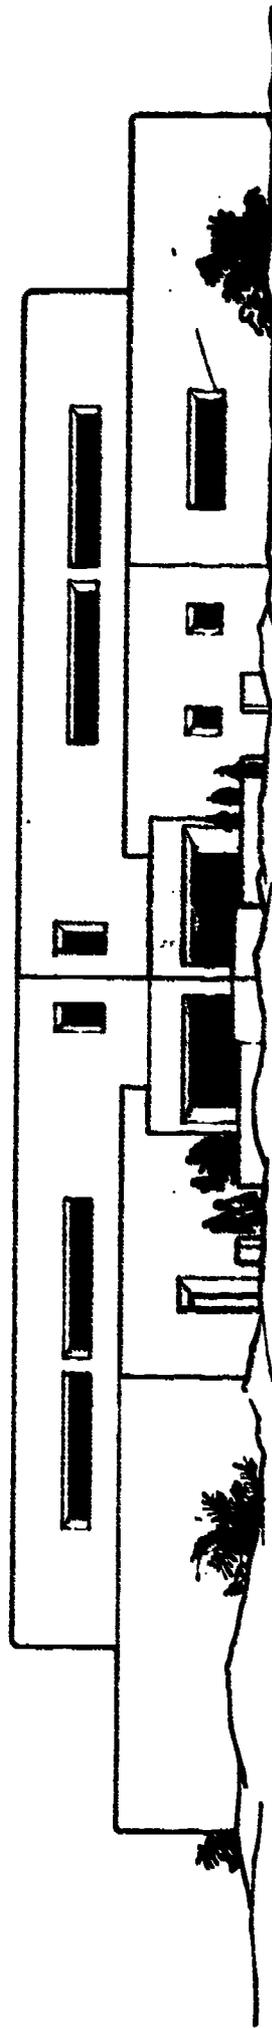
East Elevation of Scottsdale Girls' Club South
